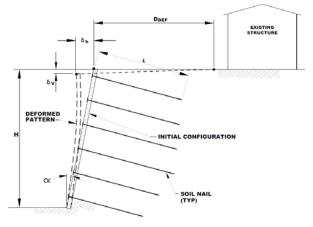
Illustration. Deformation of soil nail walls. Modified after Clouterre (1991) and Byrne et al. (1998).
